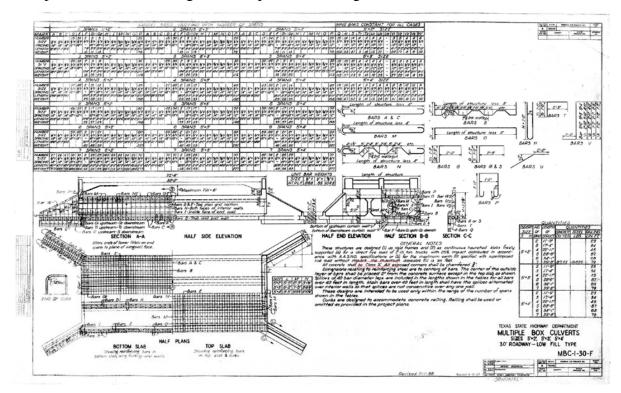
Examples of MBC-#-#-F design standards family: MBC-1-30-F
